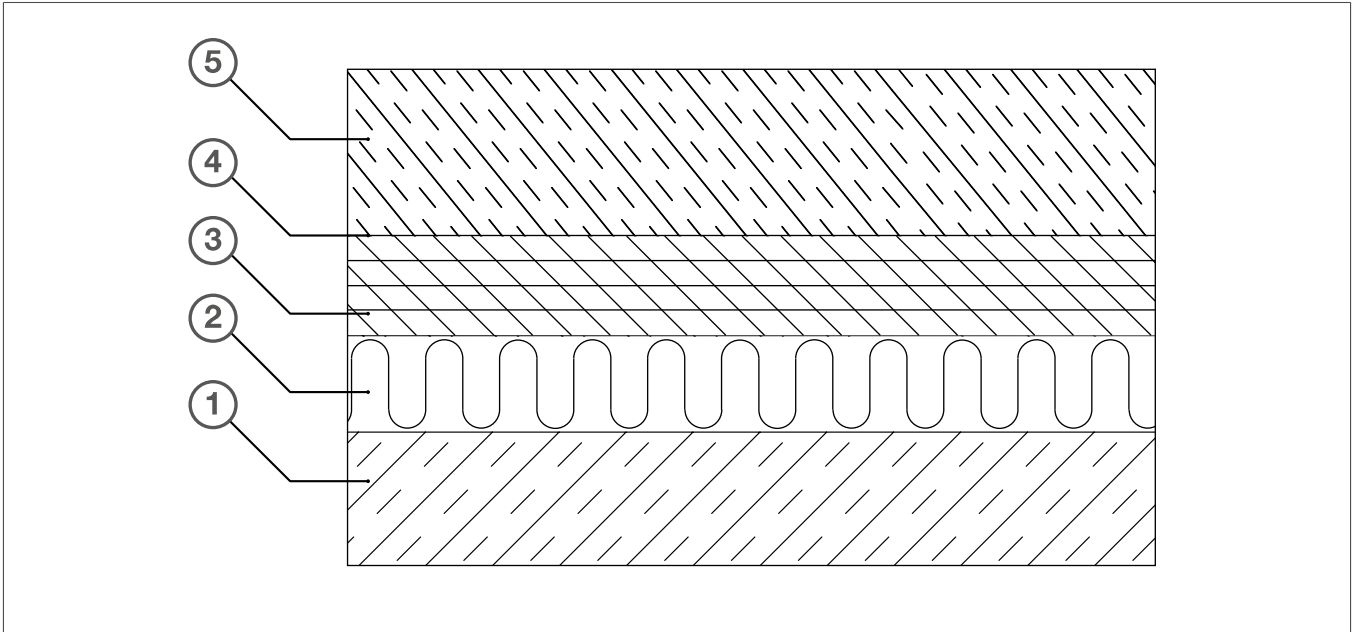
Concept drawing of the test setup in the reference area on the ceiling test station
